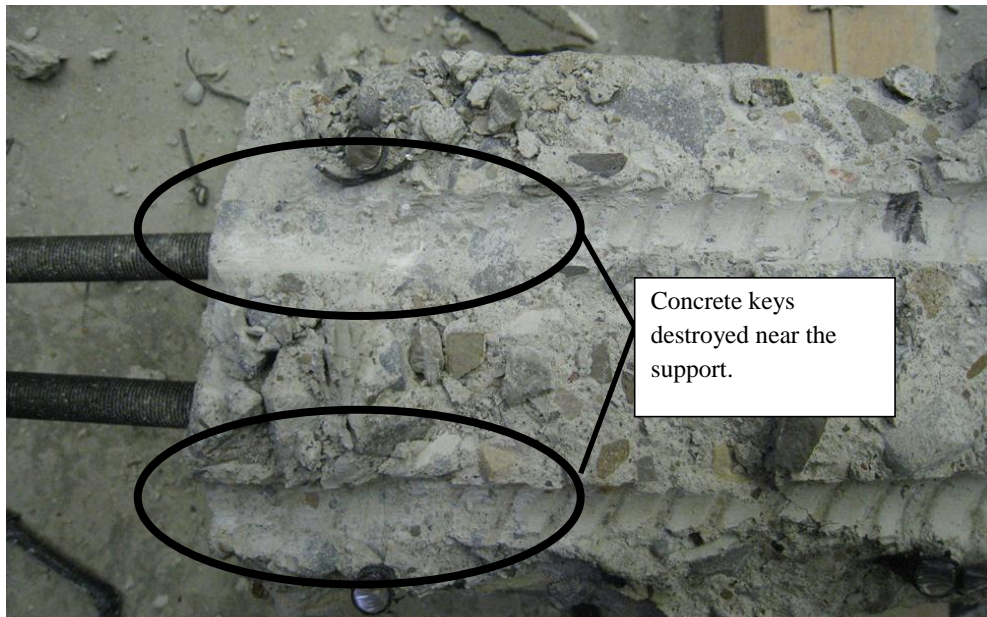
Typical concrete keys crushing close to the support for beams with stirrup configuration A. This picture is taken from Beam M-A-100-0-3 after failure. The beam is turned upside-down.
